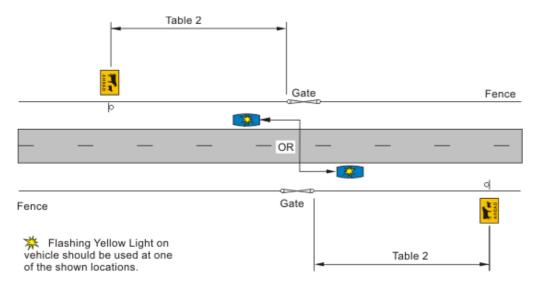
Typical Stock Crossing Site – for bitumen roads/gravel roads. NOTE: Gravel roads – there is no requirement for orange flashing lights
